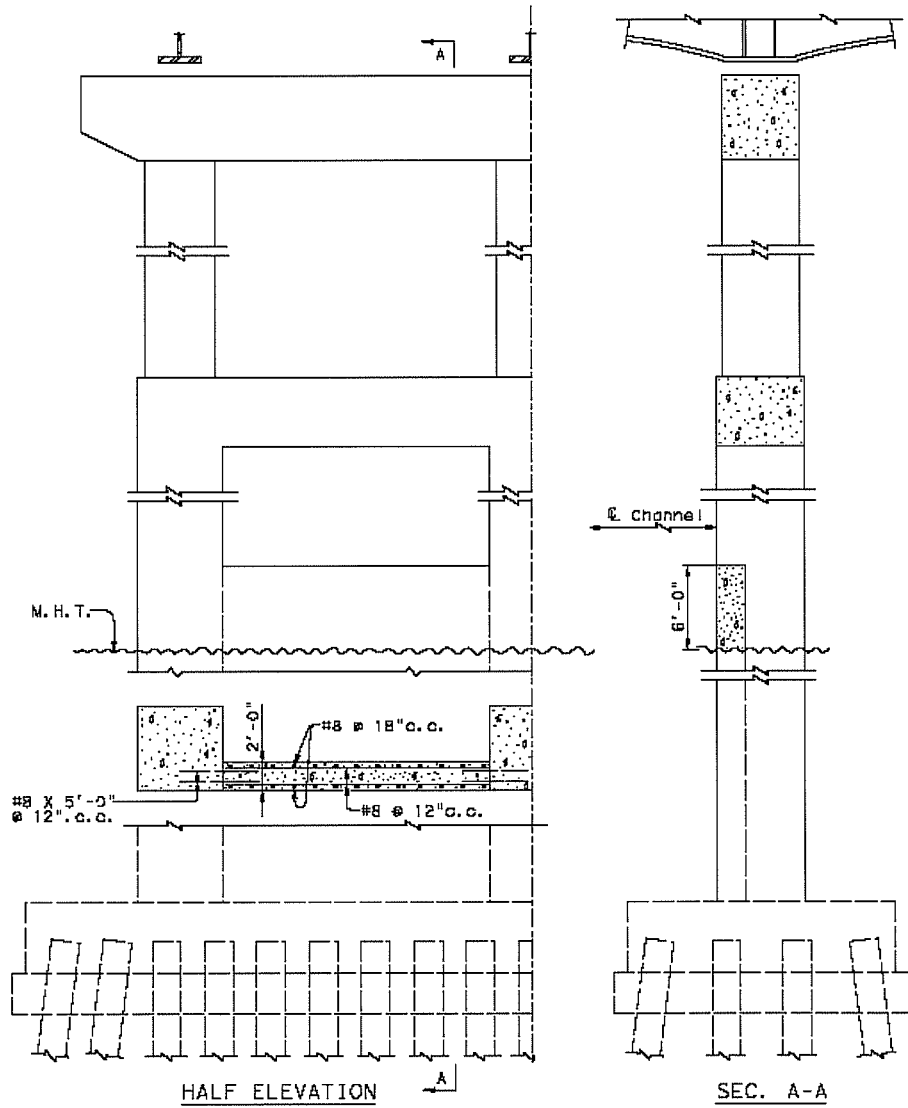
Bridge Pier with Shear Wall (TXDOT, 2001)
